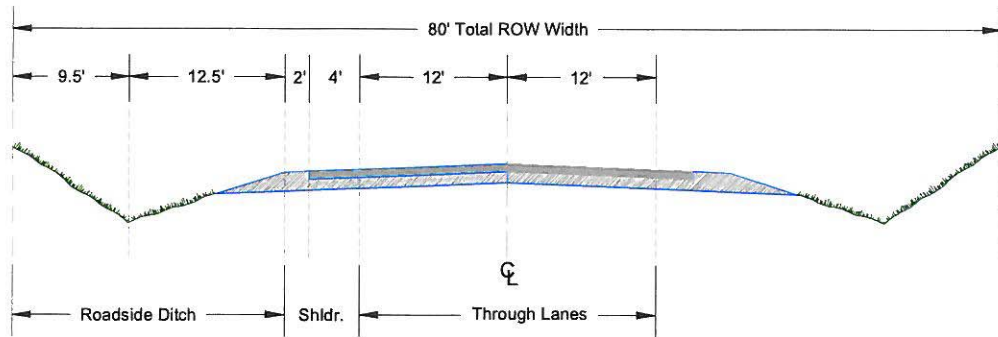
Typical Rural Minor Arterial Partial Cross Section
